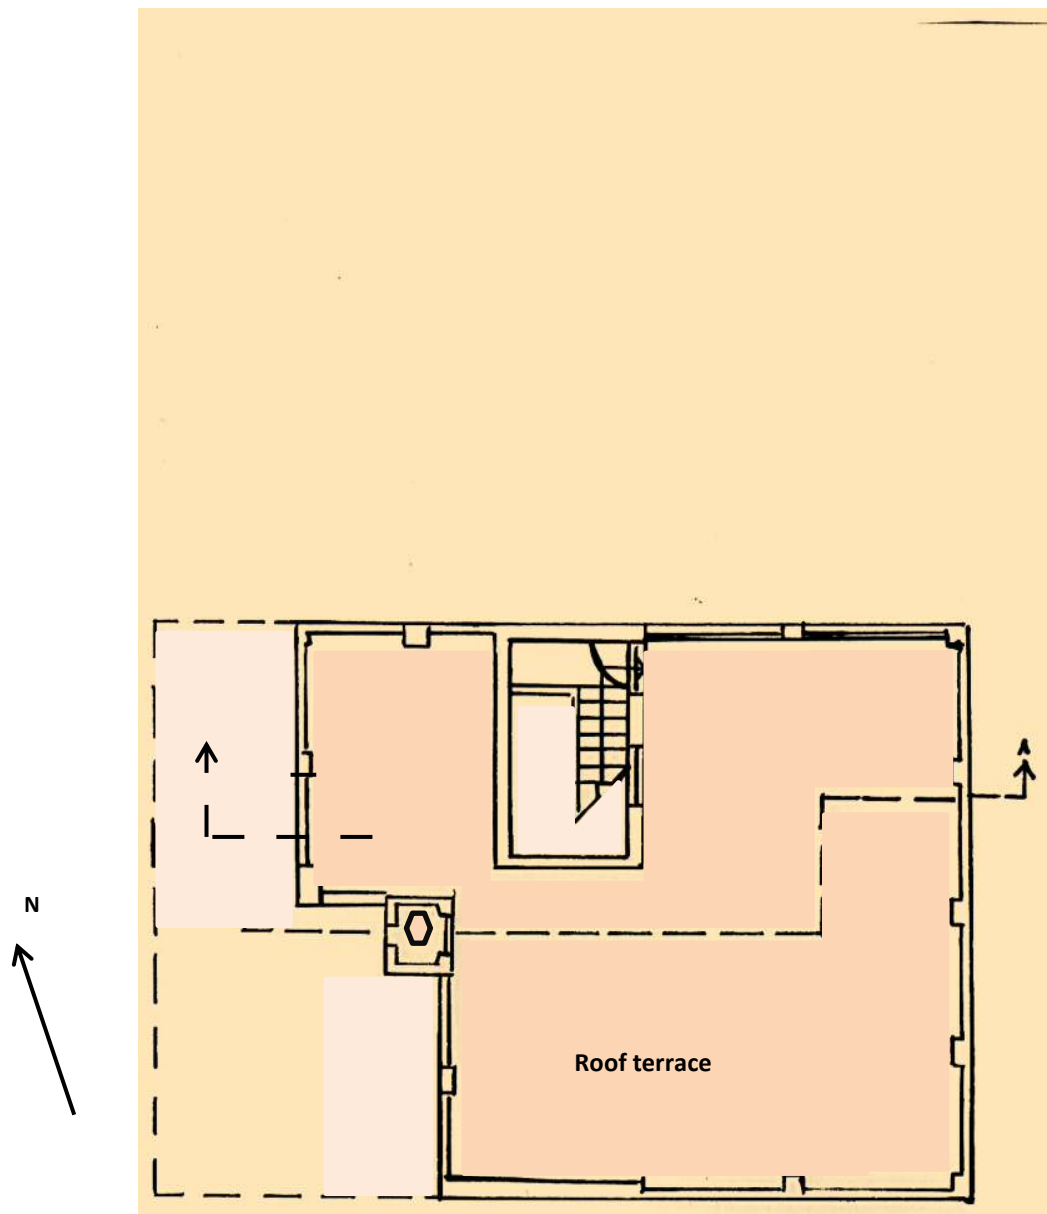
Roof terrace level plan of the modern house No. 7. Scale: 1:100
